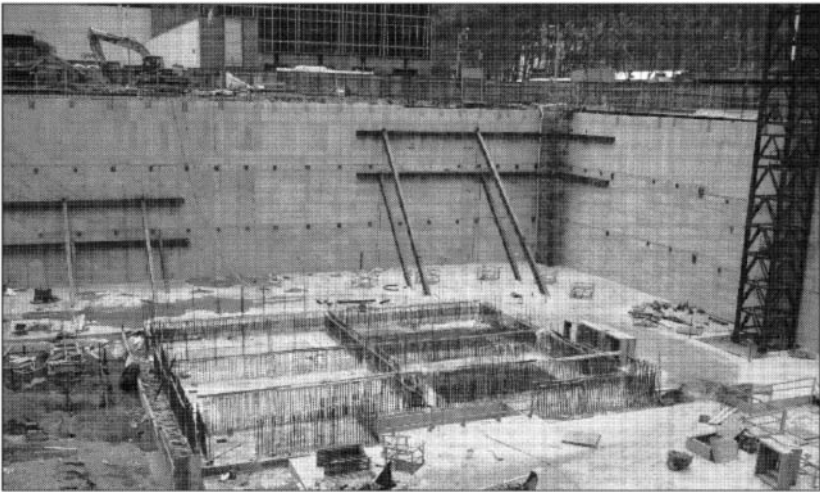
Foundation walls, slab on ground, and core footings used GBFS in the concrete mix design. (Photo copyright Severud Associates)
